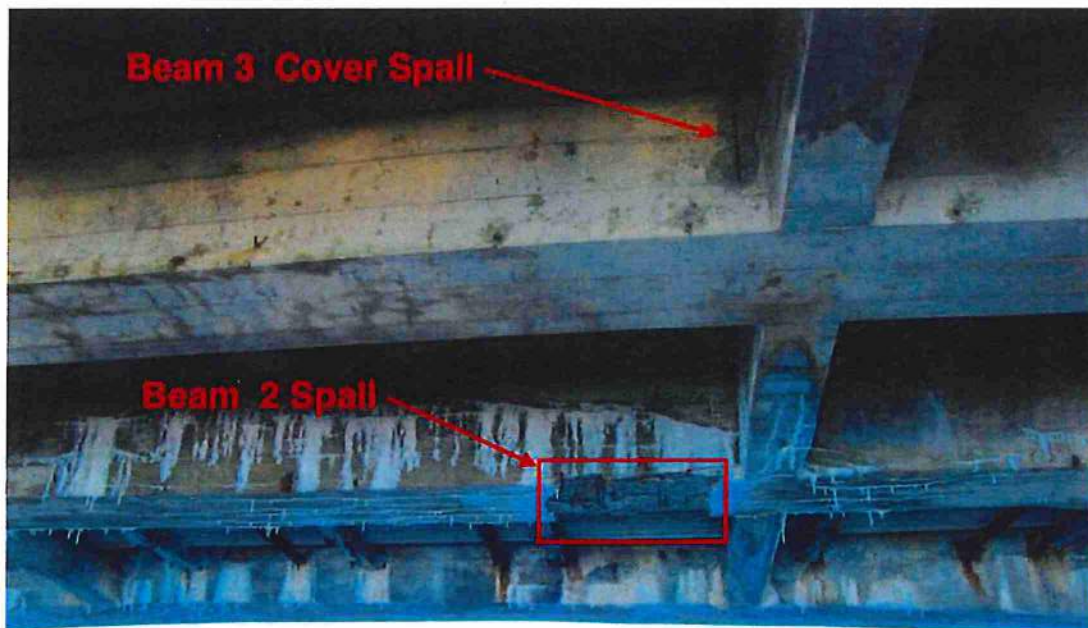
Underside of span 2 at midspan looking north. BM 3 in foreground and BM 2 with spall in background
